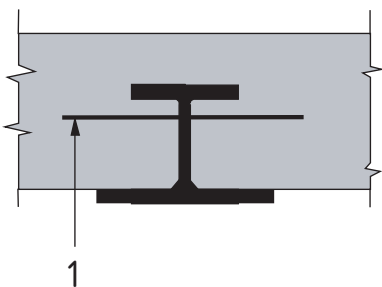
Composite beam comprising steel beam with no concrete encasement
